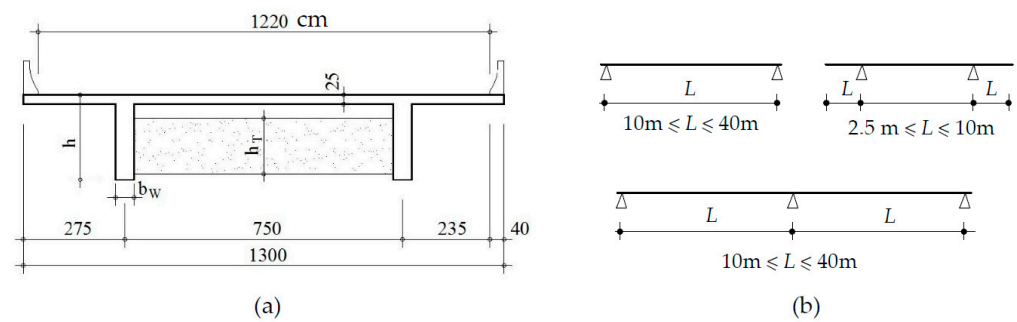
(a) RC II cross section adopted (units: cm) and (b) structural schemes.
